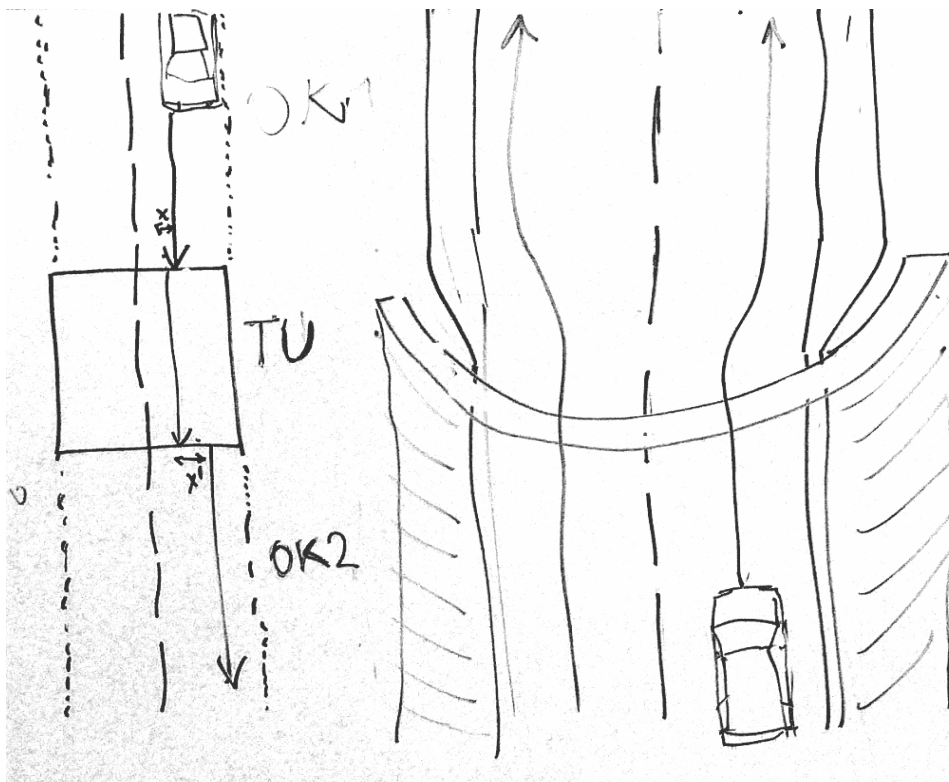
Sketch of possible driver behavior when the riding through the tunnel (left picture) and leaving the tunnel portal (right picture)
